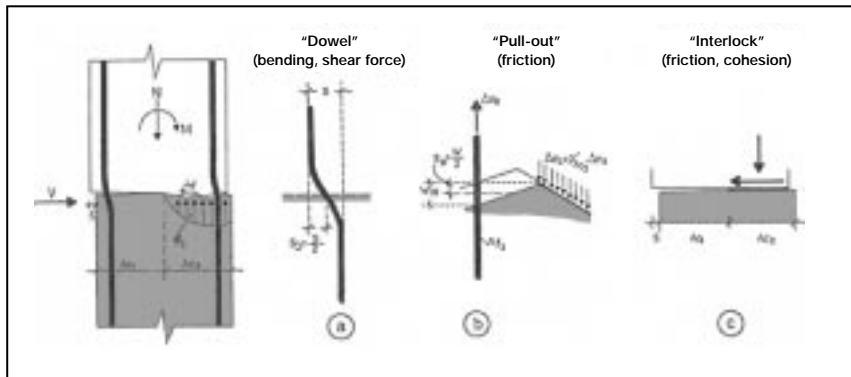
Transfer of shear across a concrete crack (shear-friction model)
